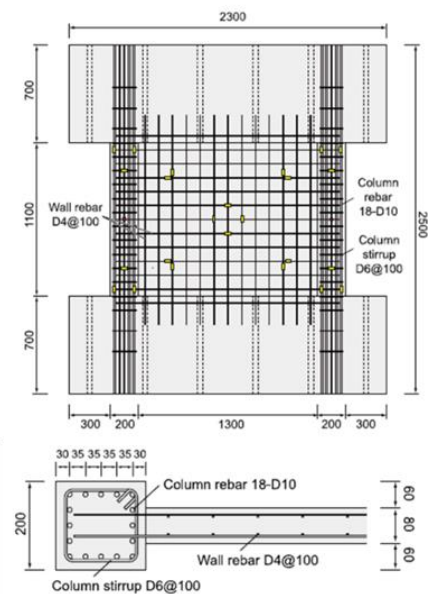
Geometry and rebar arrangement of the wall specimen⁵⁾
